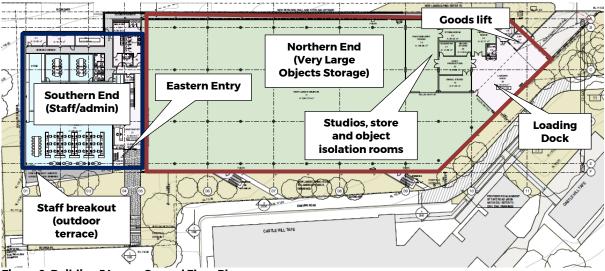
Building J Lower Ground Floor Plan Source: Lahznimmo Architects
